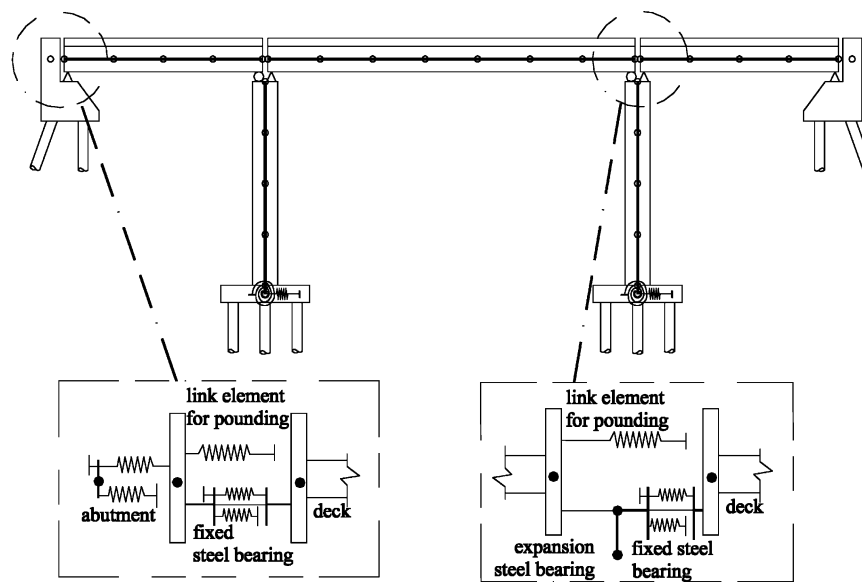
Nonlinear analytical model of multi-span simply supported steel girder bridge including nonlinear elements used for the abutments, bearings, and columns.
